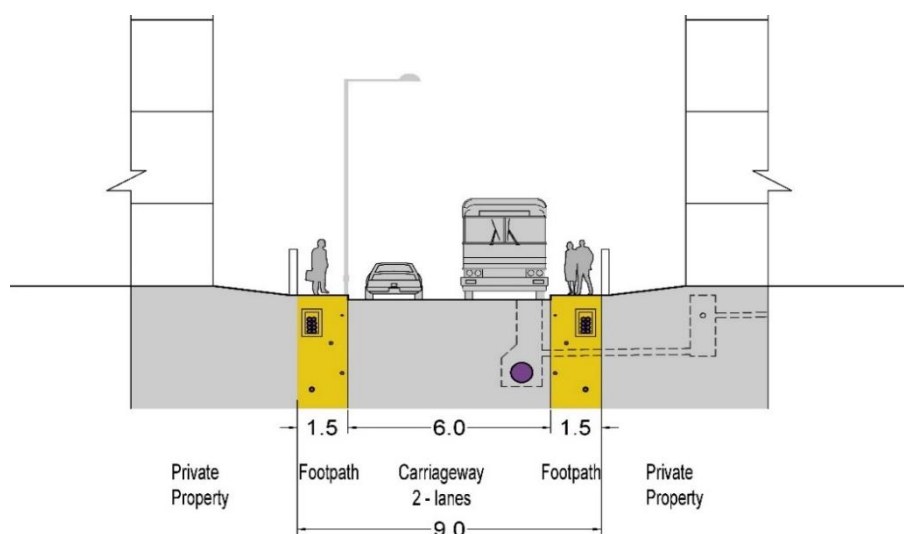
TYPICAL SECTION OF 9M WIDE ROAD
